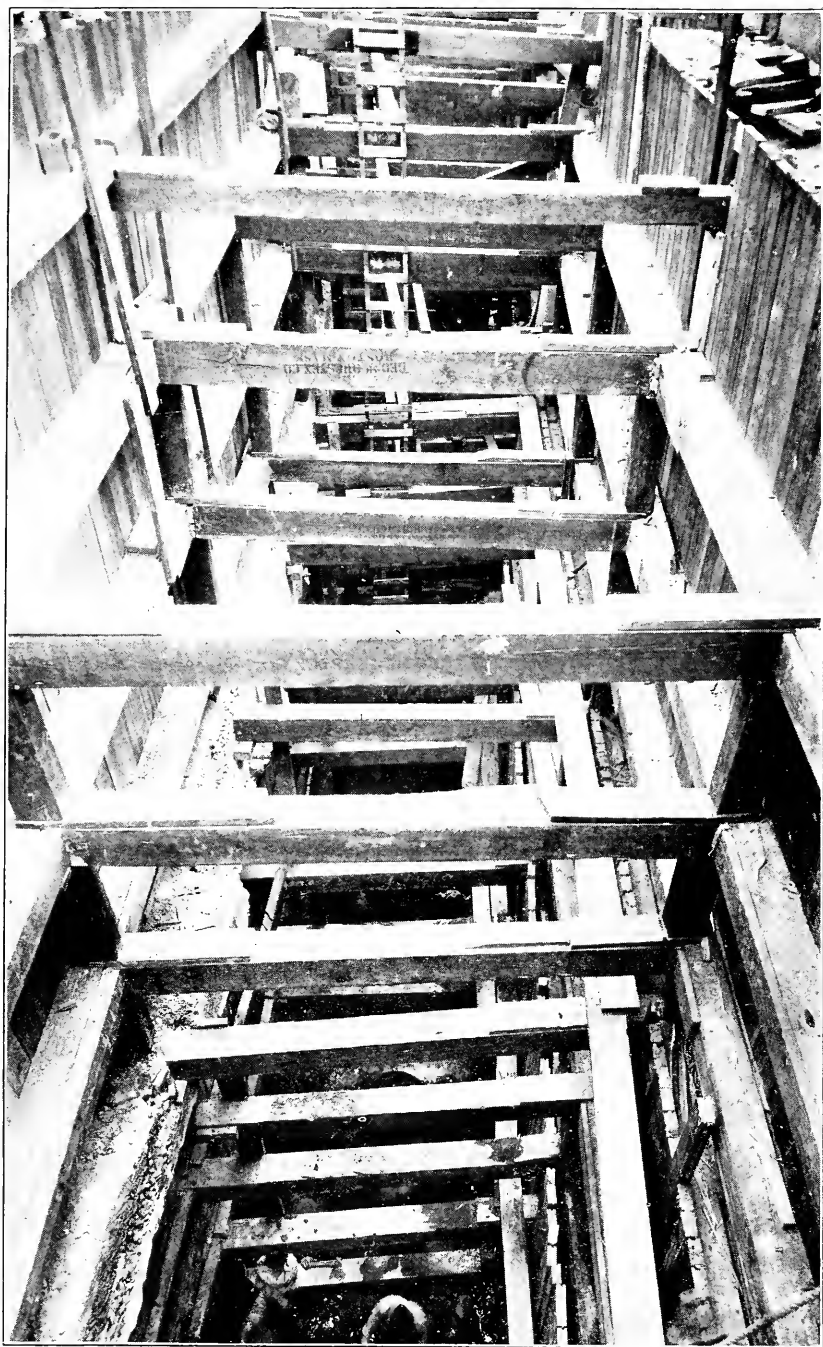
PLATE V.—VIEW LOOKING INTO ONE OF THE CONSTRUCTION
